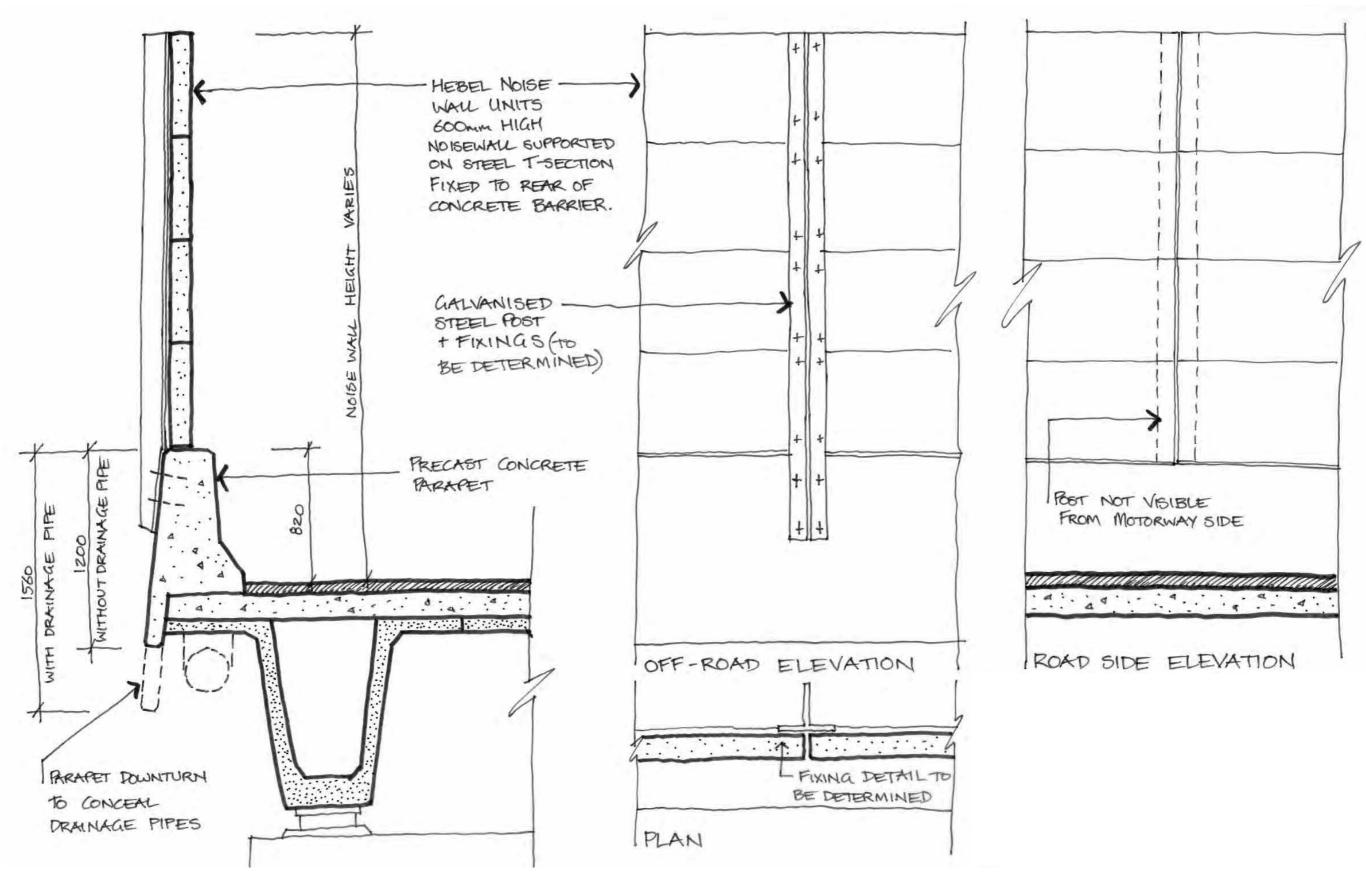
Typical Bridge Parapet Detail as used on Terrys Creek Bridge
